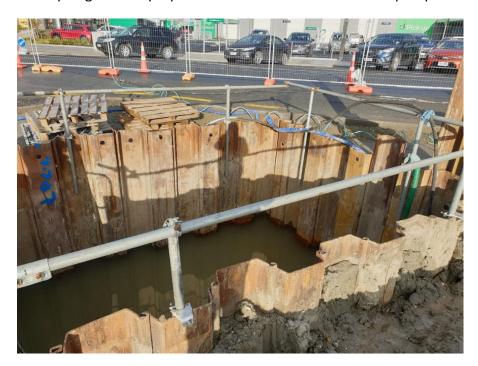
The Hub Wastewater Pump Station Sheetpiling
